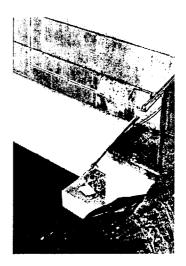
Yuzuruha Dam: Spalling of mortar on the upstream face.
